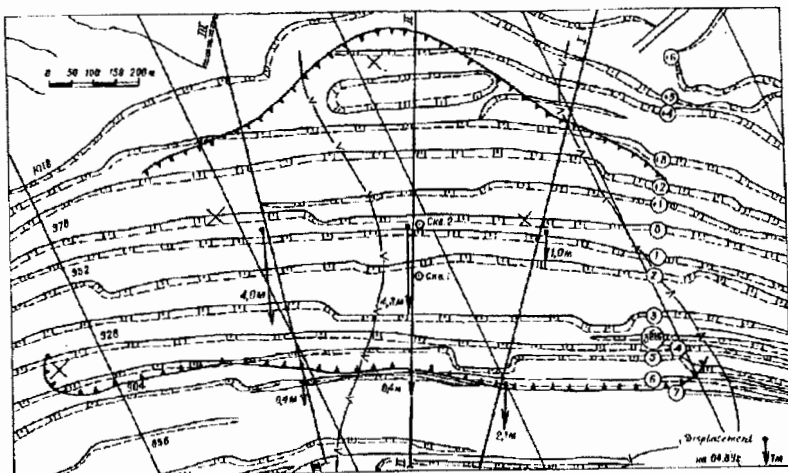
Mining plan of the Anqren open pit (April, 1989) : outline of the landslide body; I - II - III survey lines.
